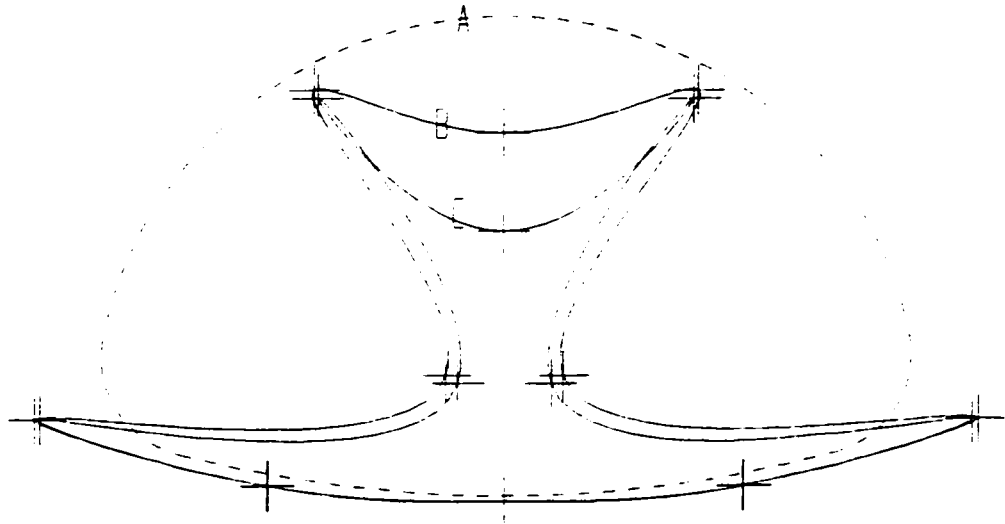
Unreinforced-Soil Pipe-Arch - Axial Load
